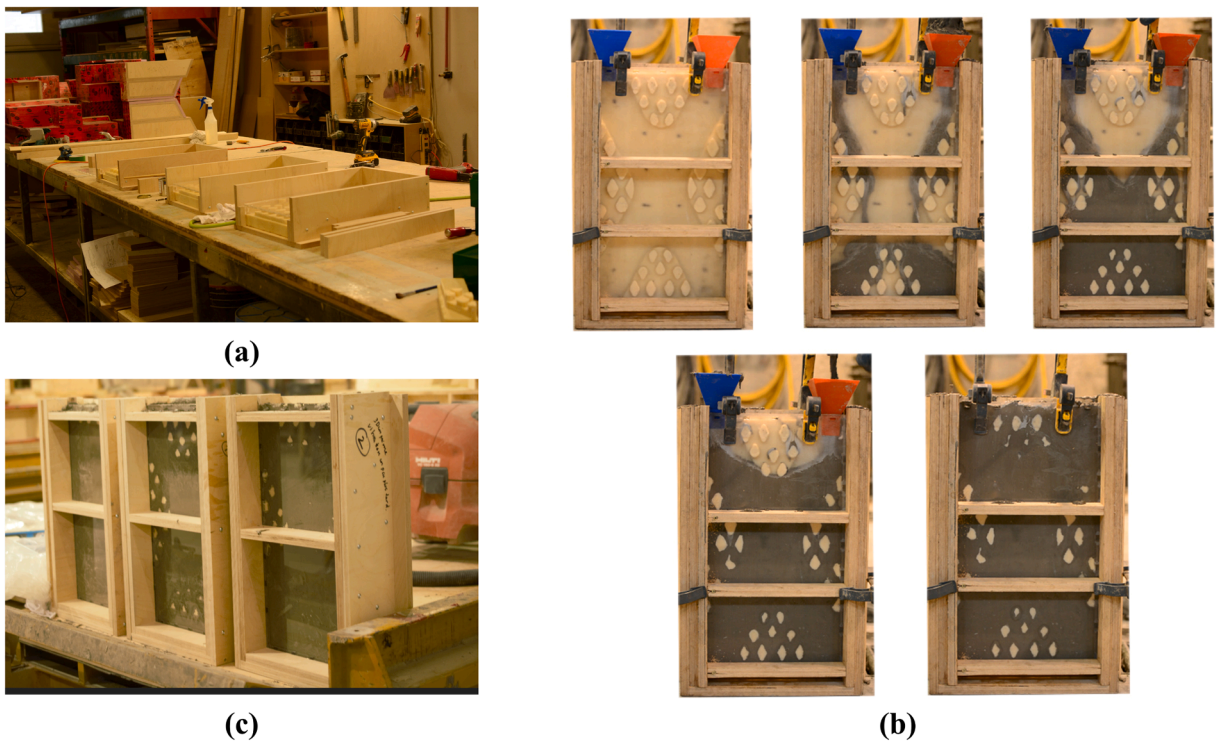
(a) reinforced mold with wood (b) casting flow (c) after casting.
